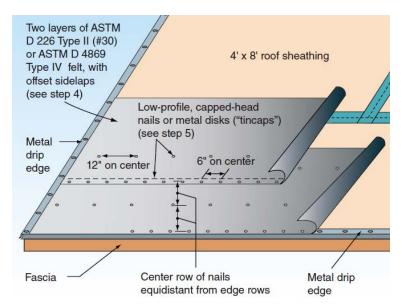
Strong underlayment installation details applied to asphalt shingle roof sheathing in high-wind regions.
